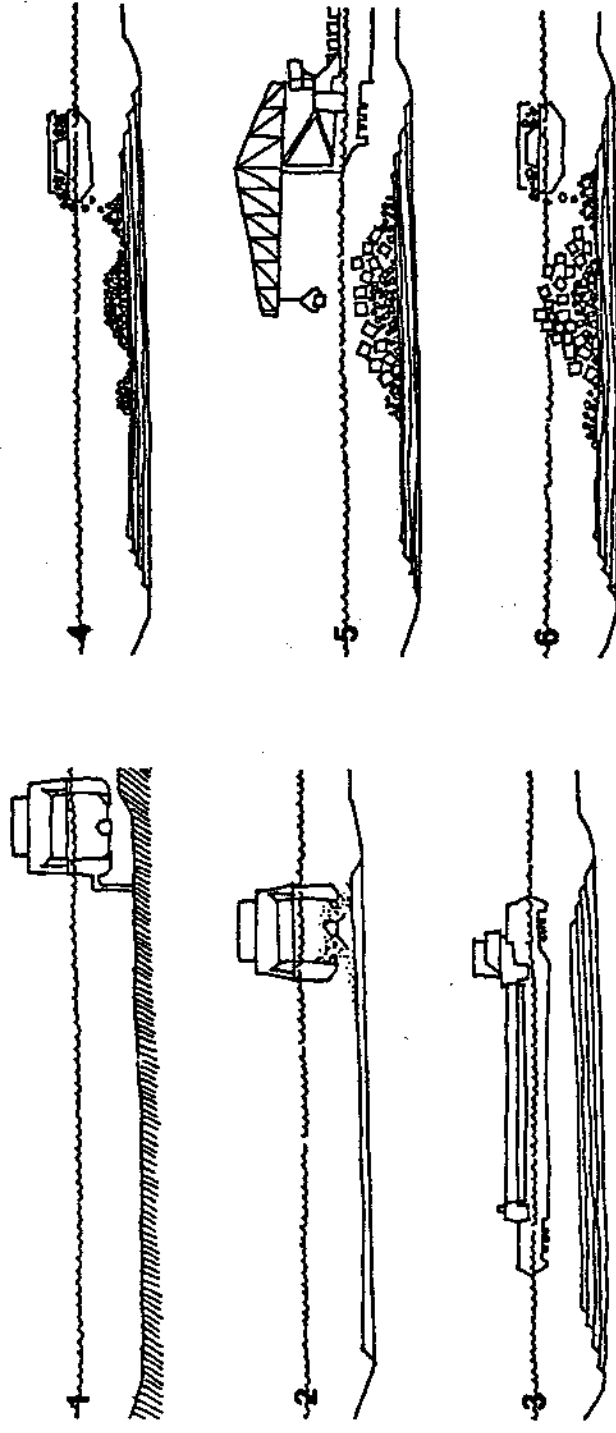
Lift Construction of Breakwater at Rotterdam, Europort.
